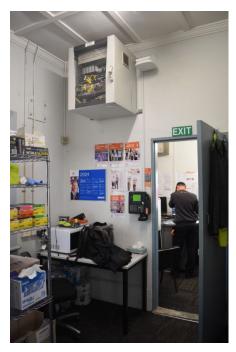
Internal view of office facing northeast looking towards plant. Floor features carpet tiles.
